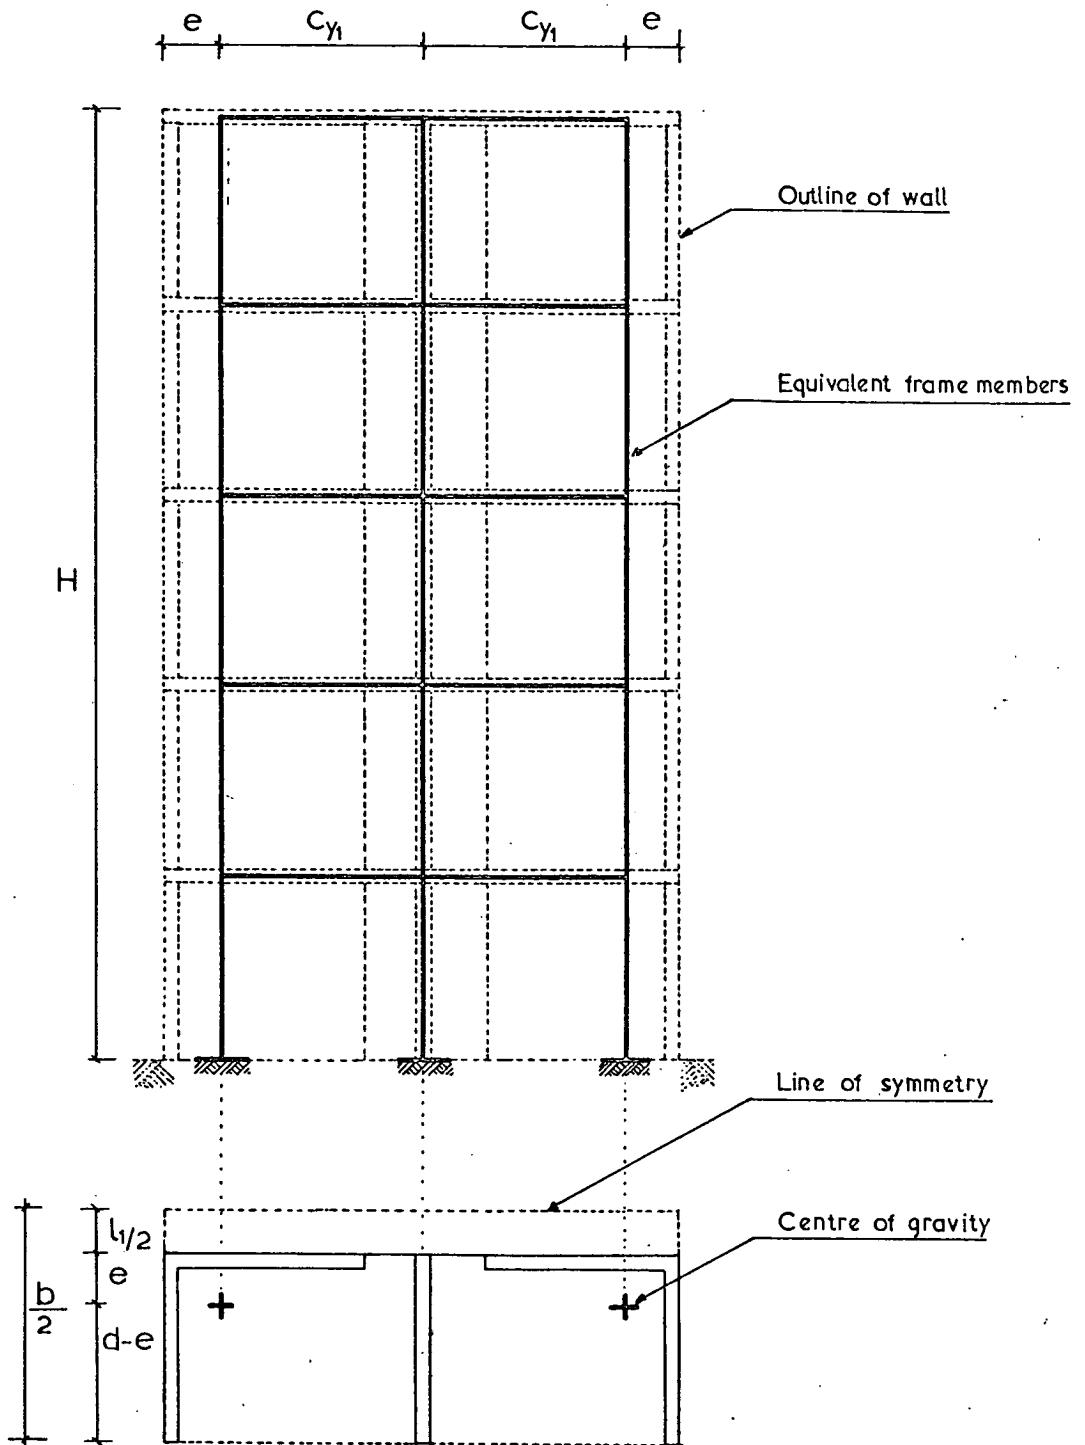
ELEVATION AND PLAN OF BUILDING
